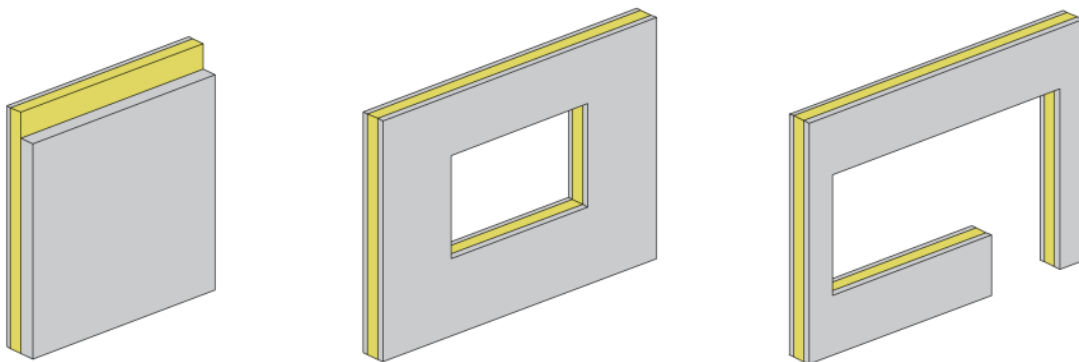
Main panel types from left to right: blind load-bearing panel; typical non-load-bearing panel with a normal window, non-load-bearing balcony back wall panel.
